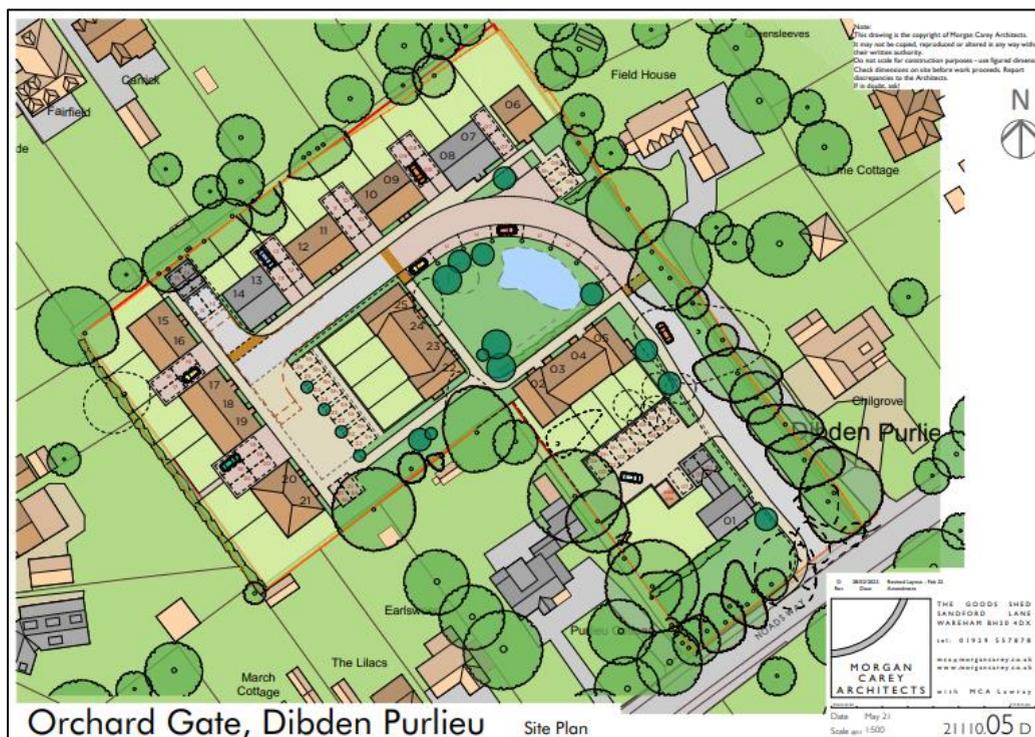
Amended pre app submission plan (plan courtesy of Morgan Carey Architects)
